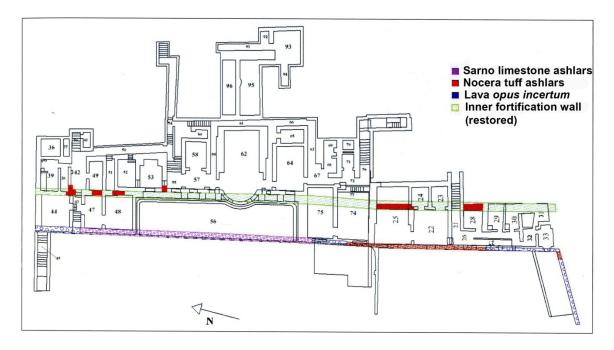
Pompeii, VII.16.17-22: Casa di Fabio Rufo and Casa di Maio Castricio, plan of basement indicating the location of the original fortification wall (after Cassetta and Costantino 2008).
